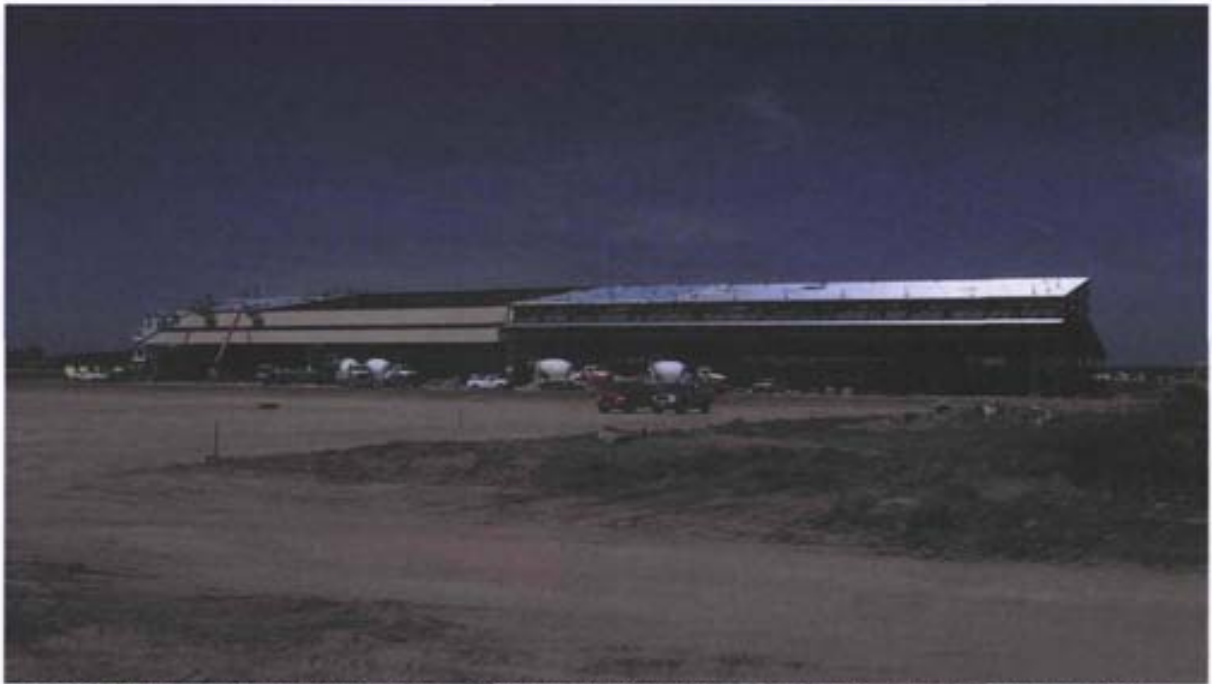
West-southwest view of Missouri Army National Guard facility under construction at Sites FT-02, LF-12, and SS-44.
